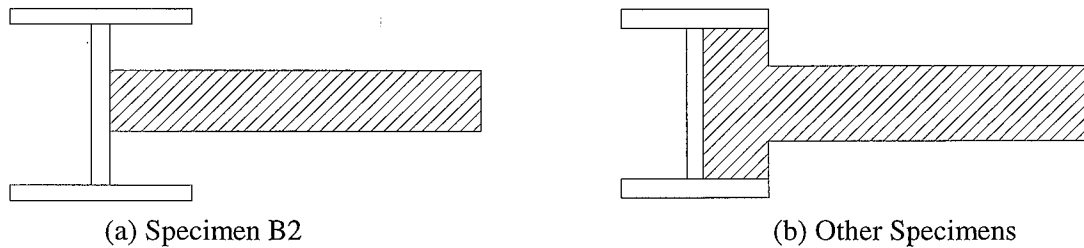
Interface Detailing of Japanese Specimen with Weak Axis of Steel Columns Oriented in the Plane of the Infill Wall
